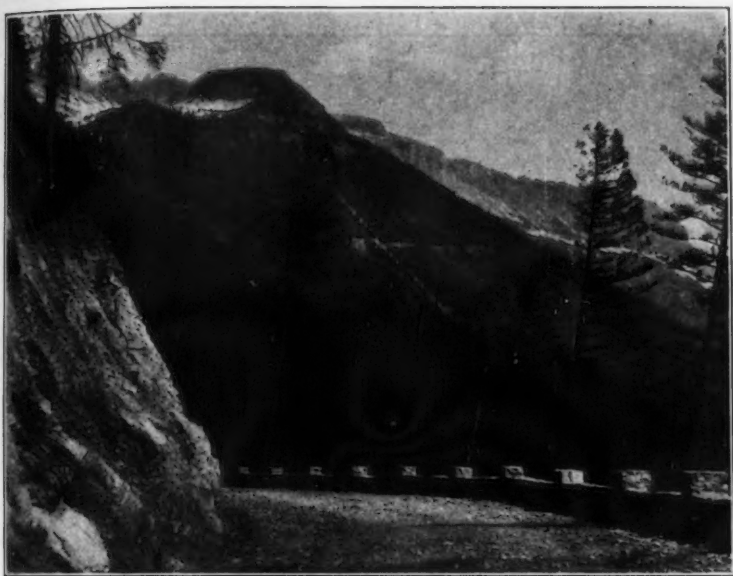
CURVED ROAD WITH MASONRY GUARD-RAIL, GLACIER NATIONAL PARK.
